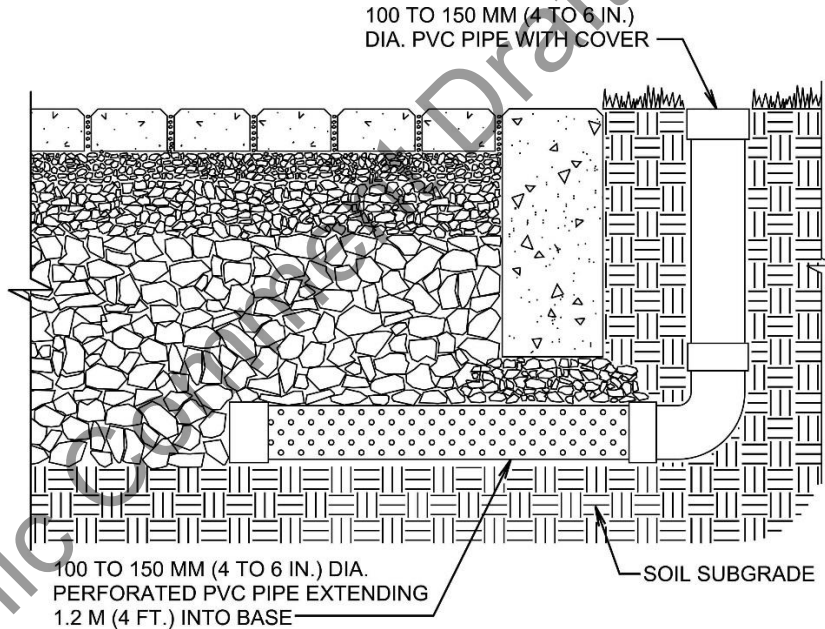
Observation Well Extending Outside PICP at the Lowest Subgrade Elevation
